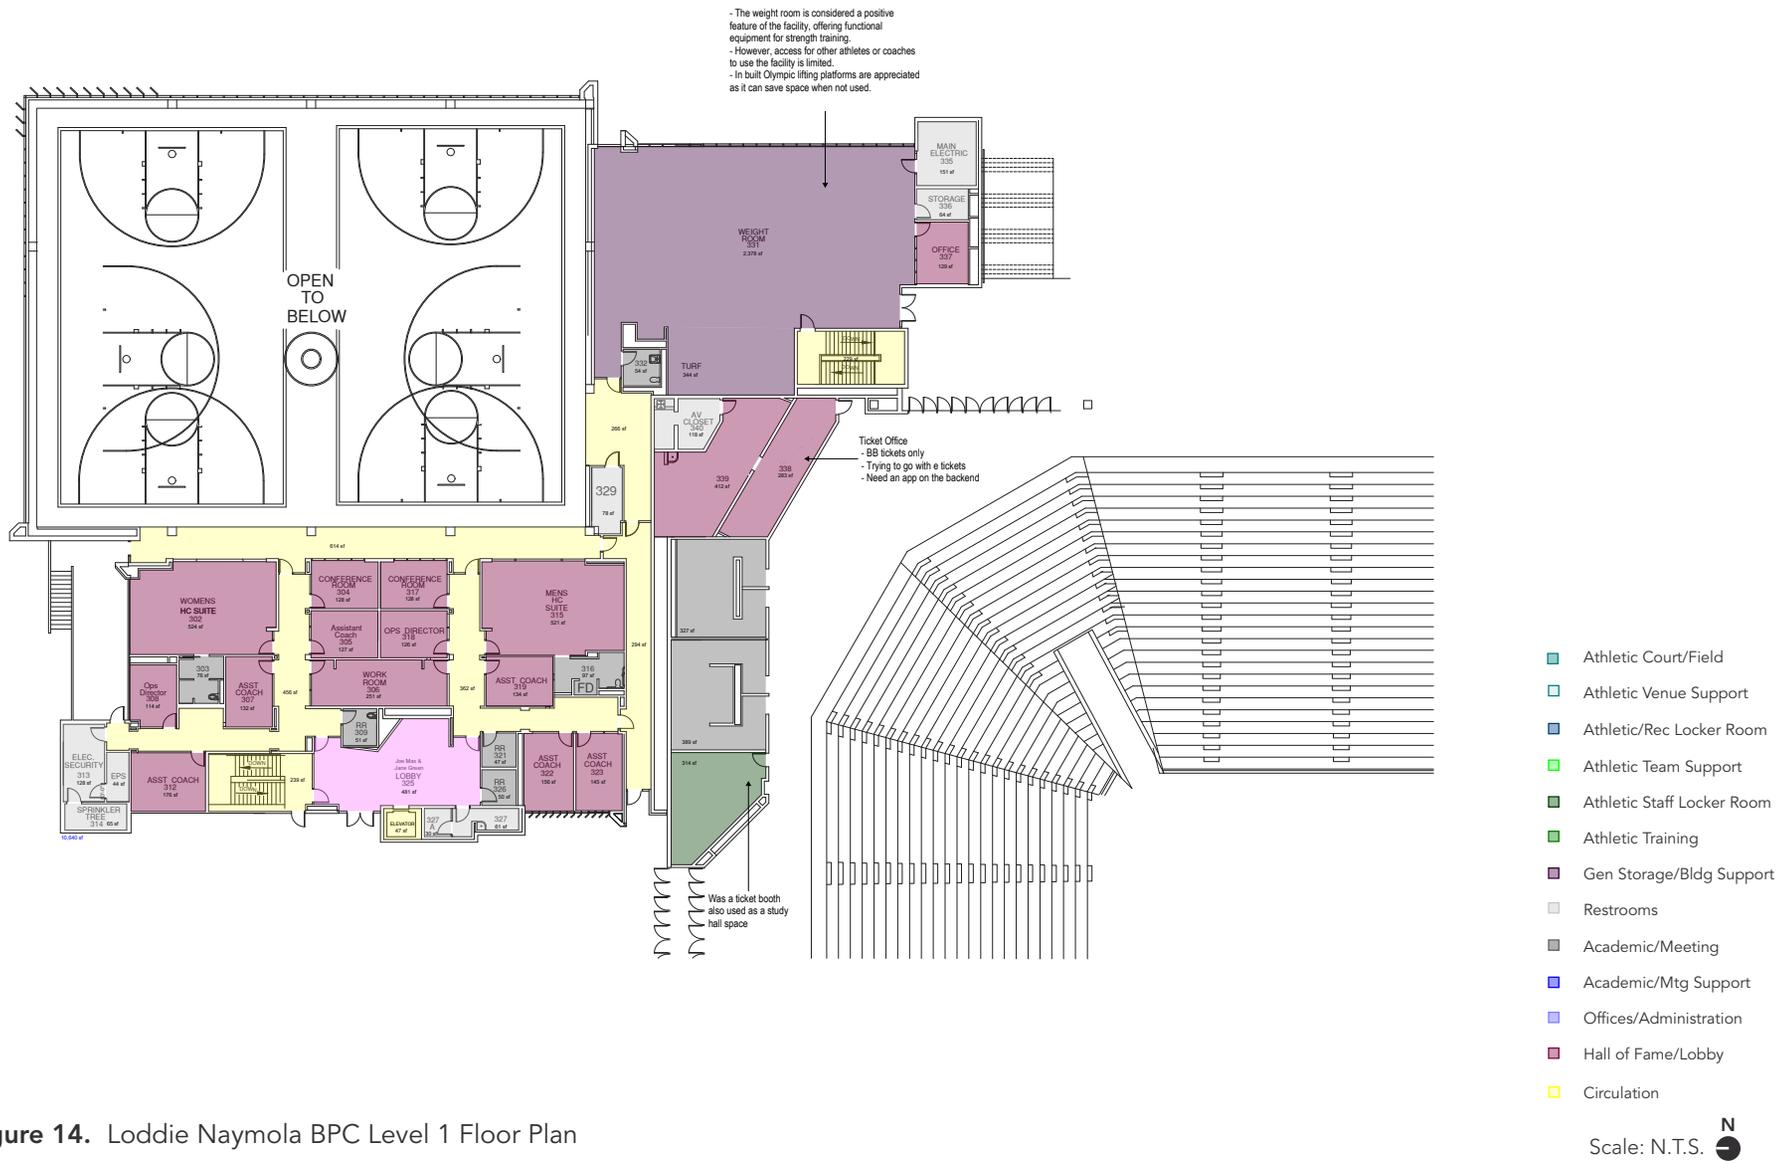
Loddie Naymola BPC Level 1 Floor Plan
